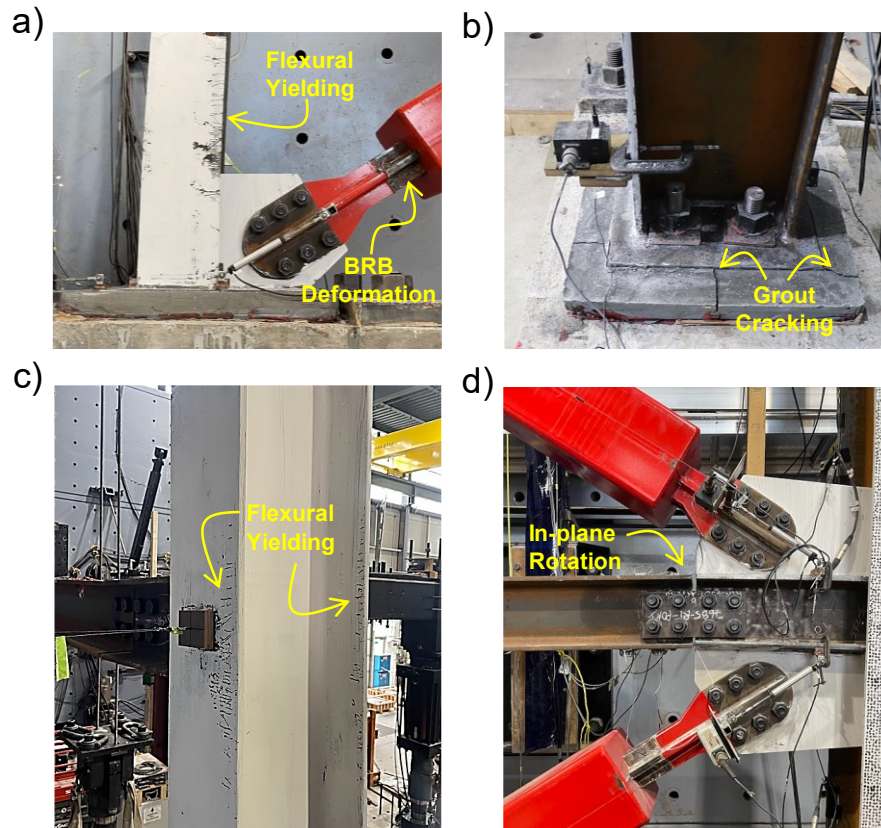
Connection response: a) yielding of the east column base; b) grout cracking at the base of the west column; c) yielding of the east column at the strut level; d) in-plane rotation of the strut splice connection to west column.
